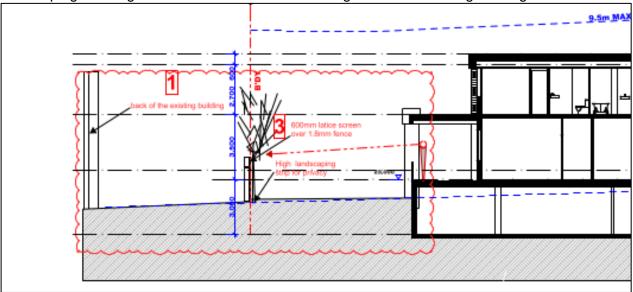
Section plan of the proposed dwelling showing the elevated rear alfresco.
